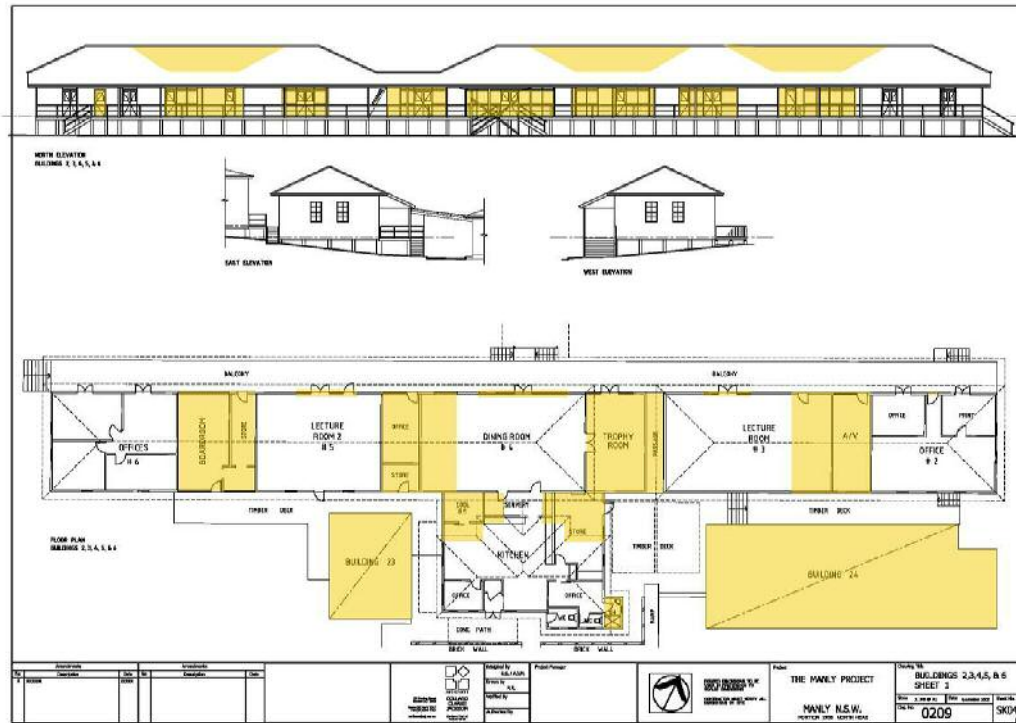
Drawing showing the axial hospital group with those parts adapted from the original coloured - these include infills between the pavilion wards and kitchen and modifications to roof forms and openings. Collard Clarke Jackson Architects - March 2003 annotated NBR&P Architects 2006.
